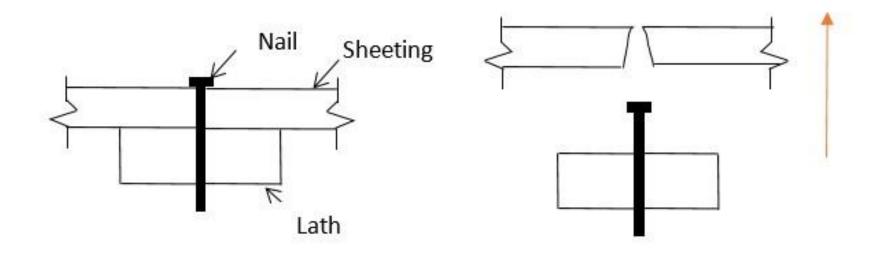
Sheeting-to-Lath Connection Failure Mode: Sheeting Tear-out Cause: Sheeting too thin; washers non-existent or too small or too rigid; insufficient number of fasteners or inadequate installation
